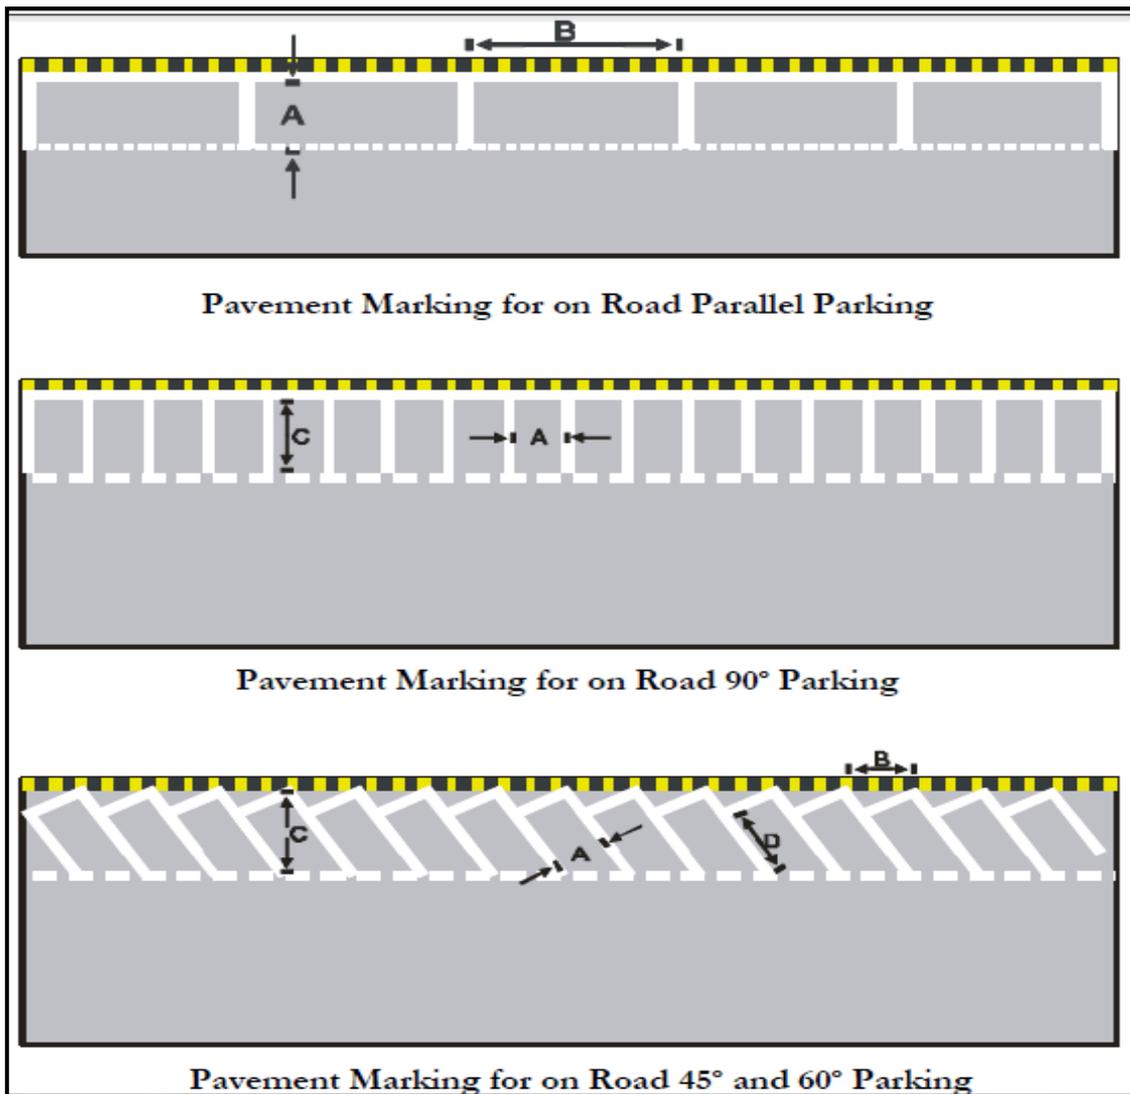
On-Street Parking Orientations (PTTM, 2008)
